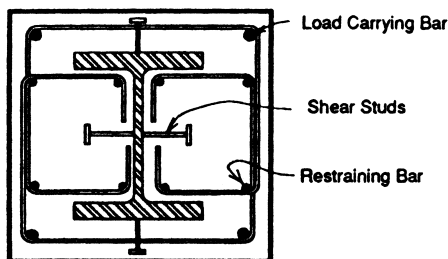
Example of a closed hoop detail for an encased composite column.
